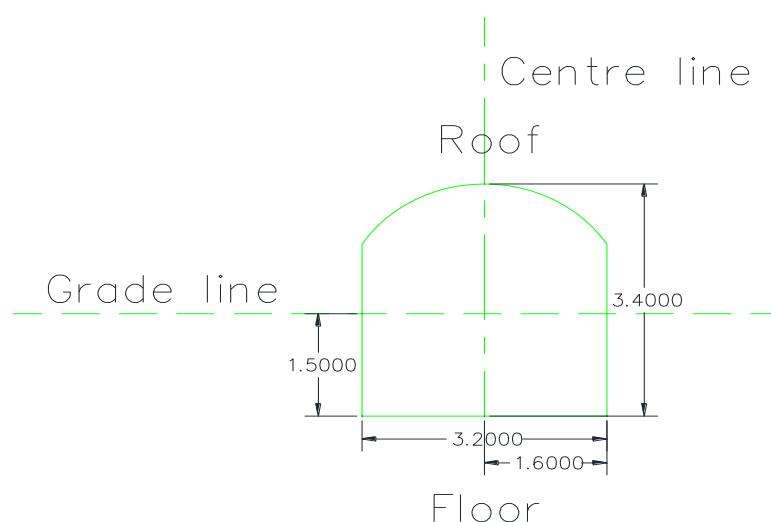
Front elevation of a 3.2 × 3.4m development end.
